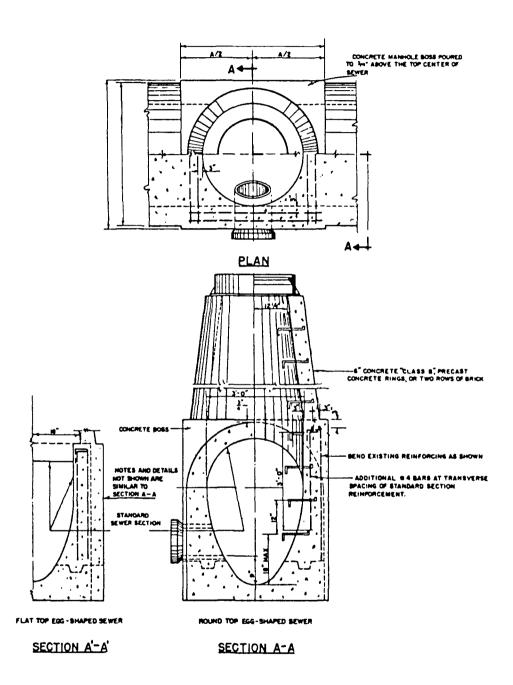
Typical sewer junction (b) Egg-shape sewers
